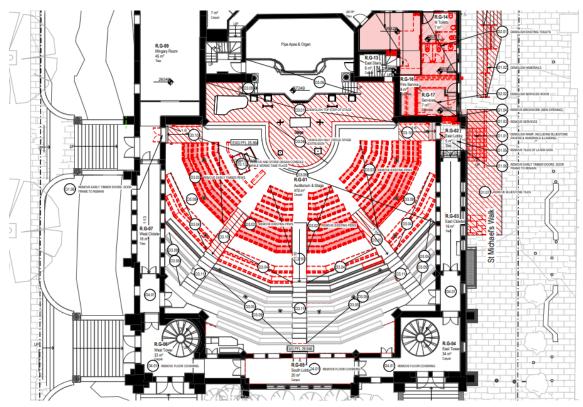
Demolition Ground Floor Plan. Source: Trethowan Architecture, 2024.
